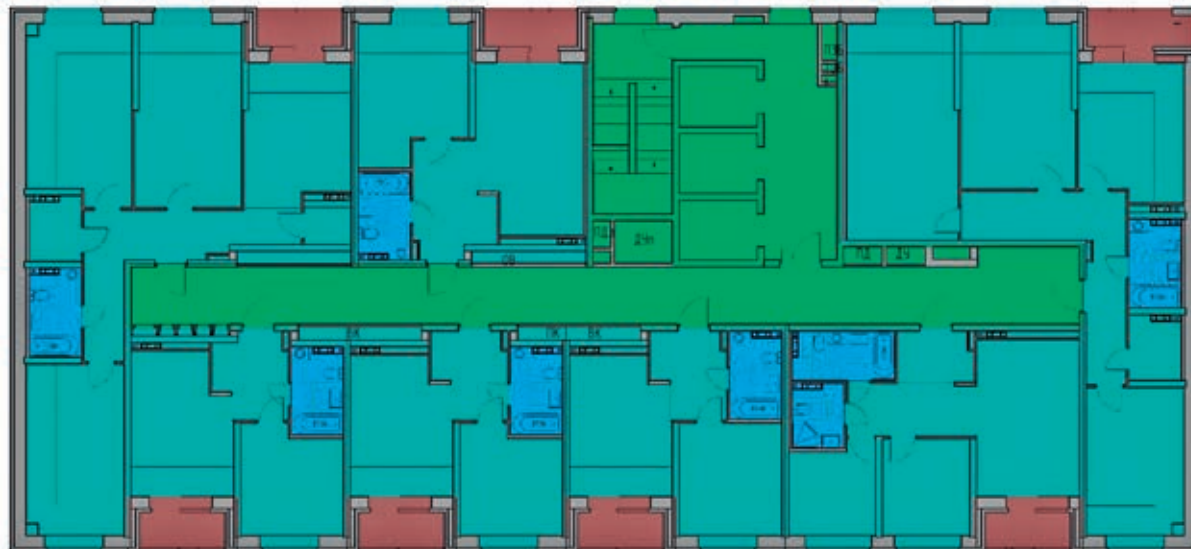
A typical floor plan consisting of elements from the BIM module library
